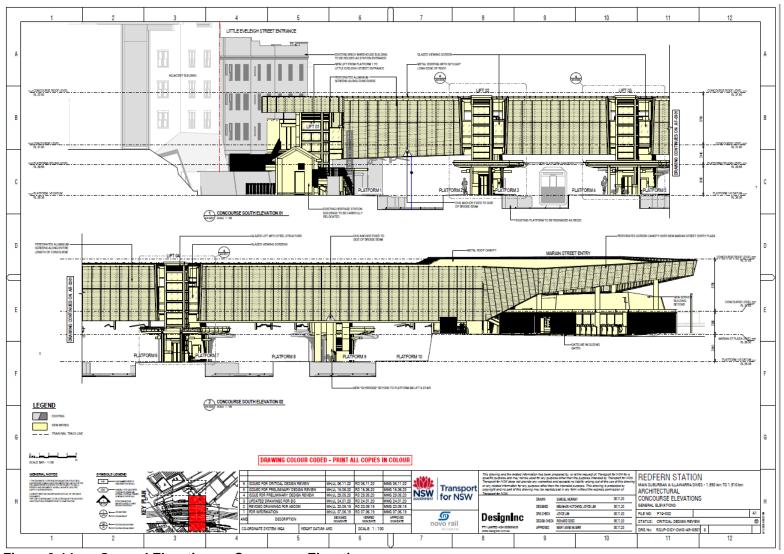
General Elevations – Concourse ElevationsDesign Inc (November 2020). DRG No. RSUP-DISY-DWG-AR-0301.
